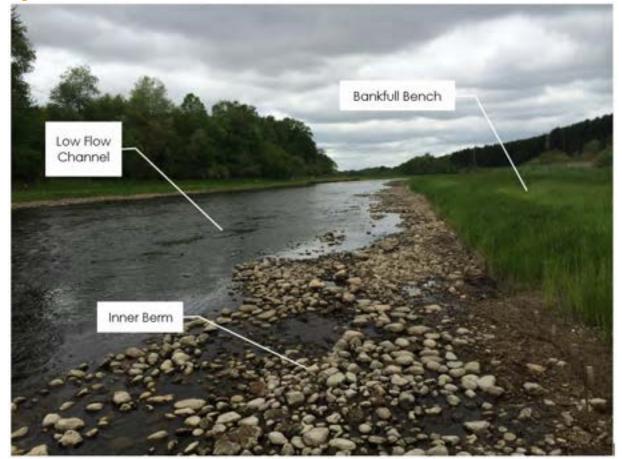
Kalamazoo River - Constructed Riffle (Post-Construction)
